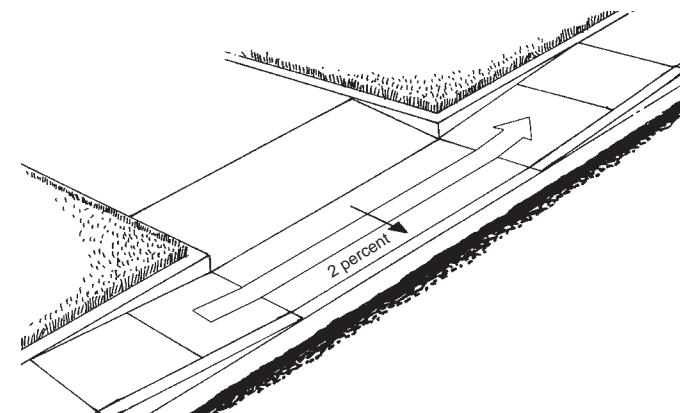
Parallel ramps are an effective way to improve access at curb ramps and driveway crossings if additional right-of-way cannot be purchased. There needs to be adequate drainage for this type of installation.
